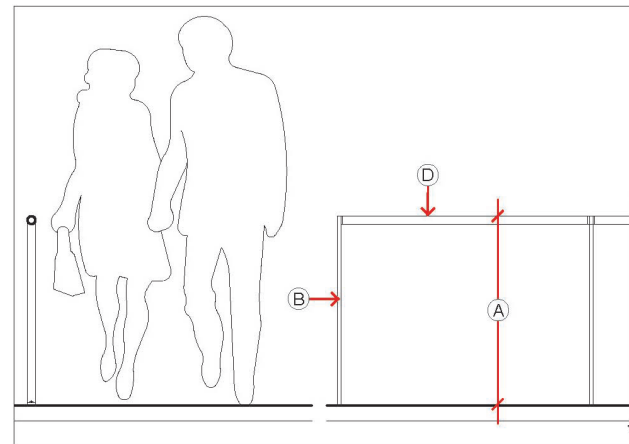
Pedestrian railing type 4 typical section and elevation
